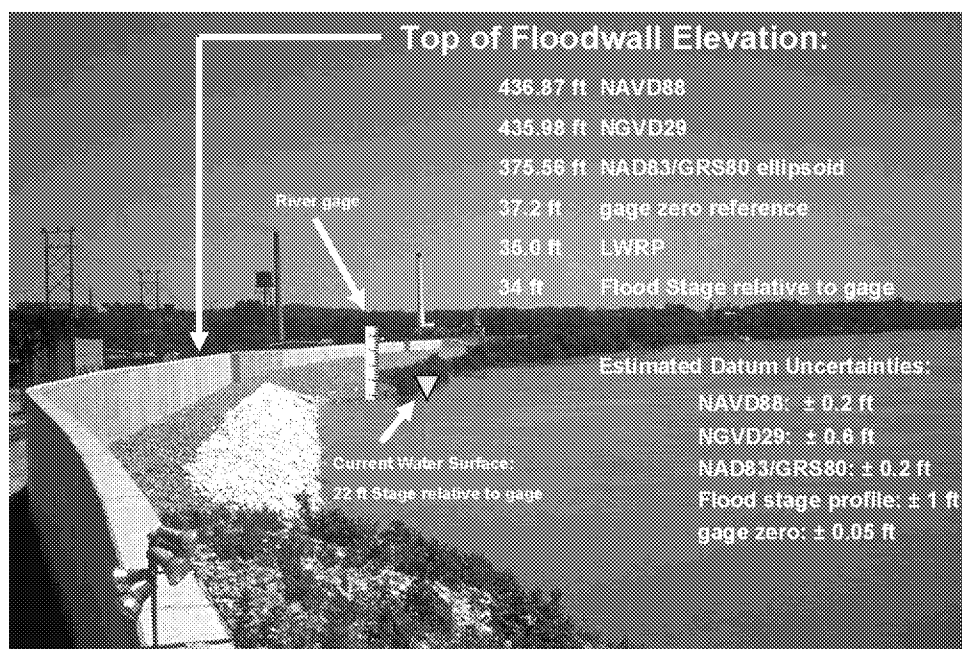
Datum and elevation uncertainties on an inland river system floodwall protection height. The reference datum uncertainties propagate to an uncertainty in the floodwall elevation. (see Chapter 9).
